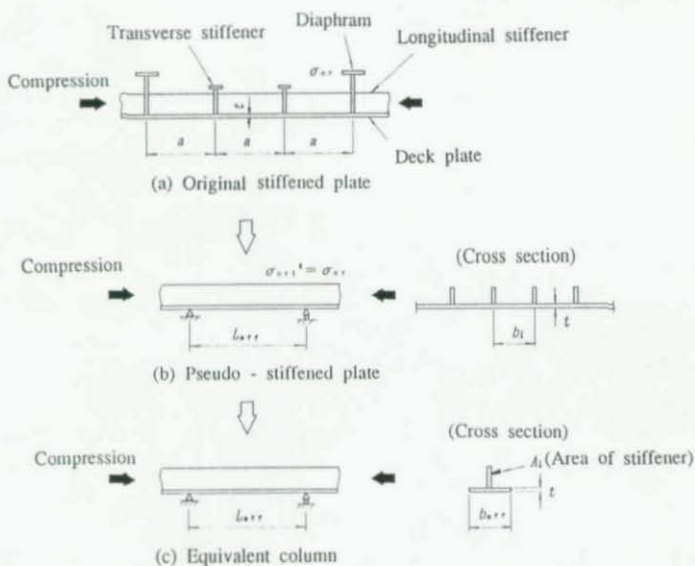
Original stiffened plate, pseudo - stiffened plate and equivalent column
